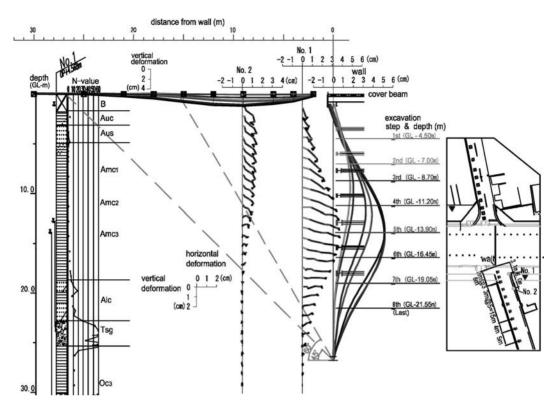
Earth retaining wall deflection, backside ground deformation vector and distribution of backside ground surface settlement at the A-site.
